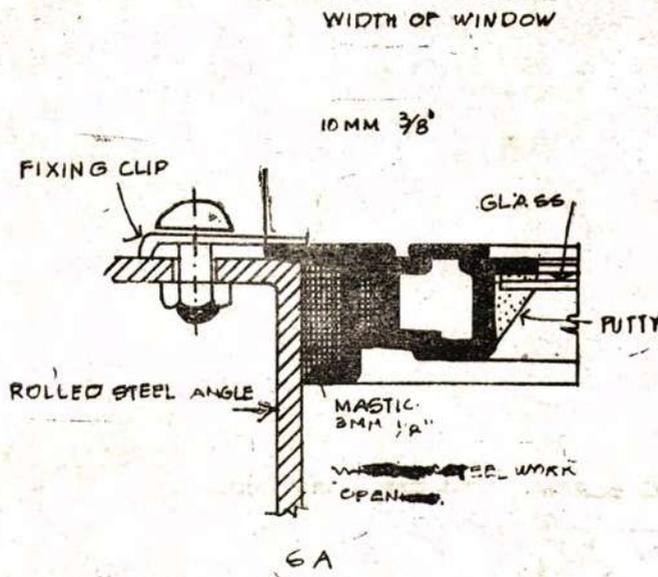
DETAILS OF FIXED WINDOW TO STEEL WORK
